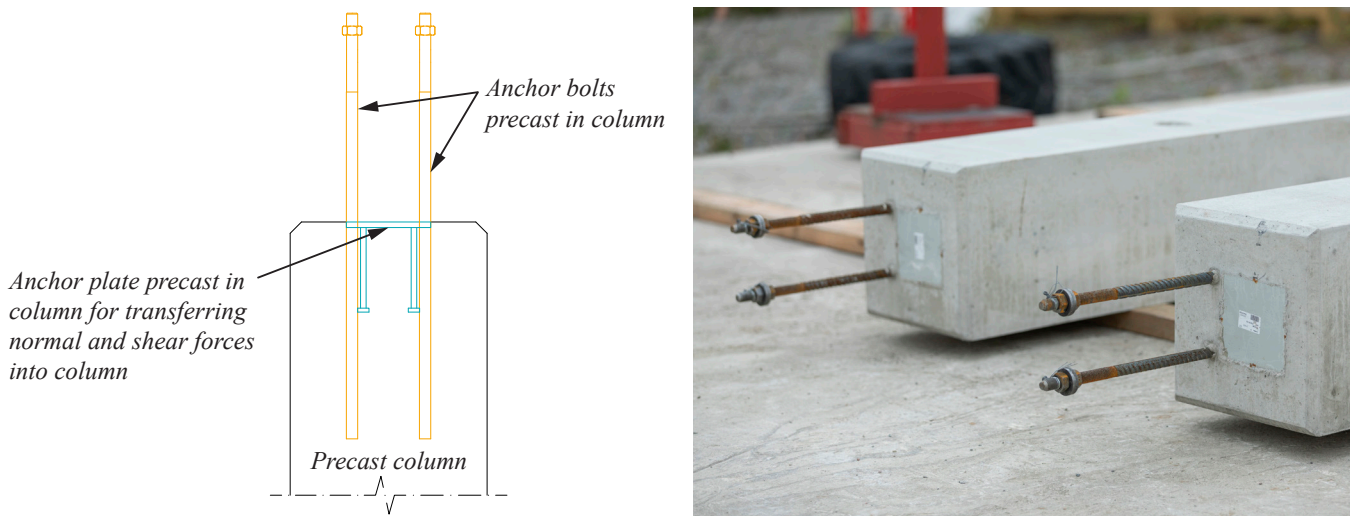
Section details of anchor bolts and plate cast in column (left), anchor bolts and plate in column (right).
